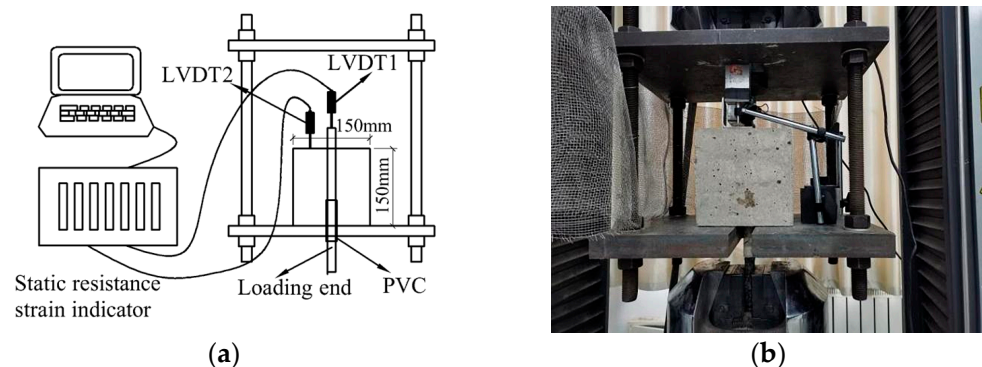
Pullout test setup. (a) Pullout test equipment; (b) universal tensile-compression testing machine.
